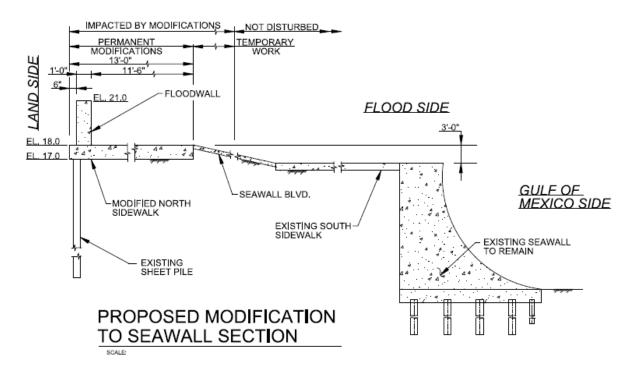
Typical Seal Wall Improvement Section (Annex 19)
